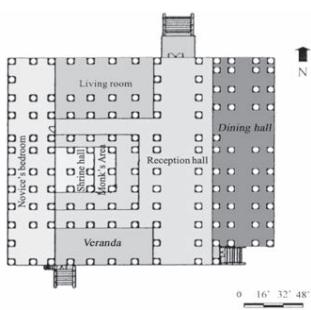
Plan of Yayhaw Kyaung^{*18}
